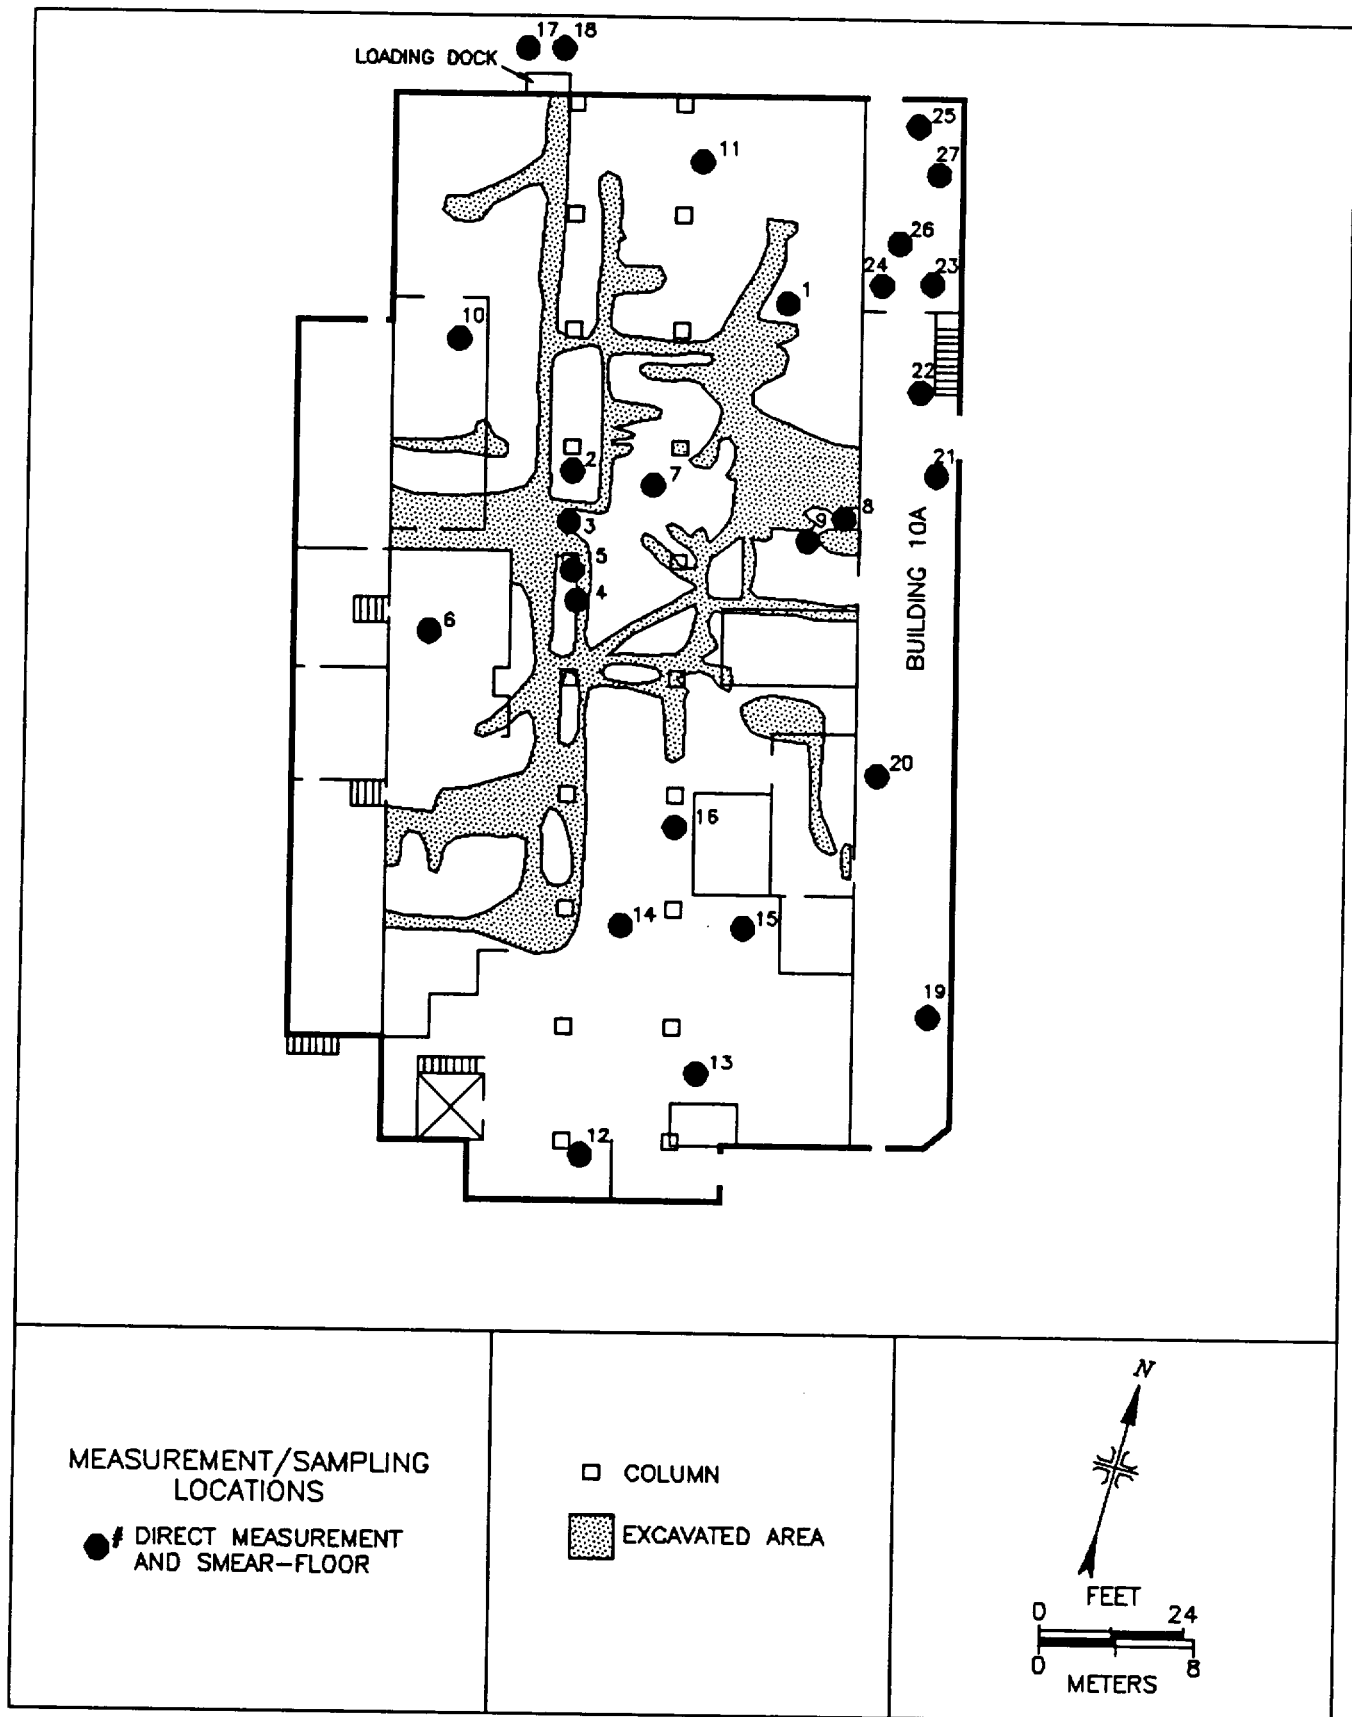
Buildings 9 and 10A – Measurement and Sampling Locations
